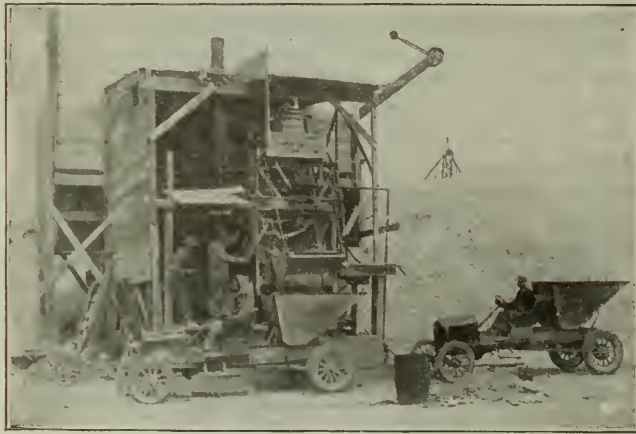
CENTRAL UNLOADING AND MIXING PLANT
